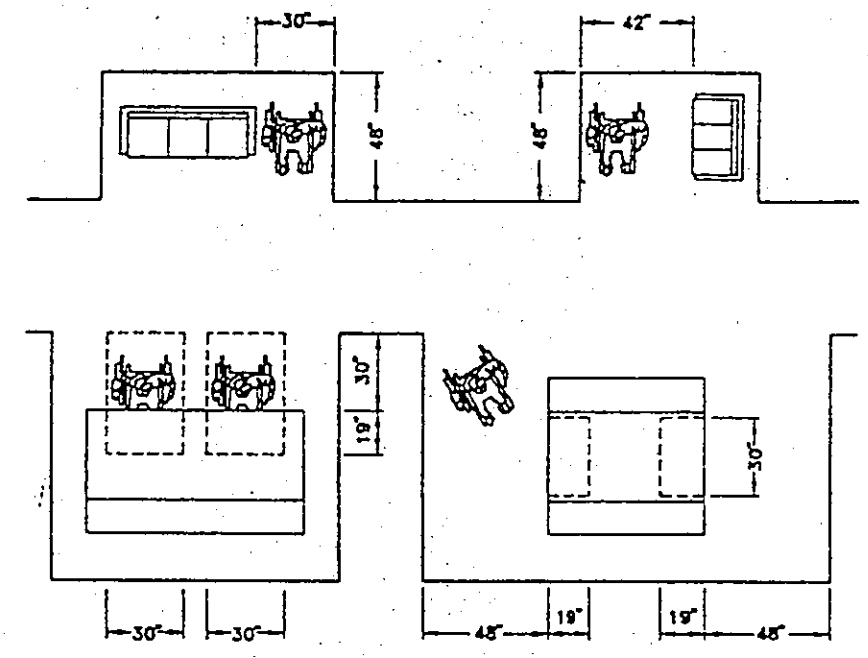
A MINIMUM CLEARANCES FOR SEATING AND TABLES
